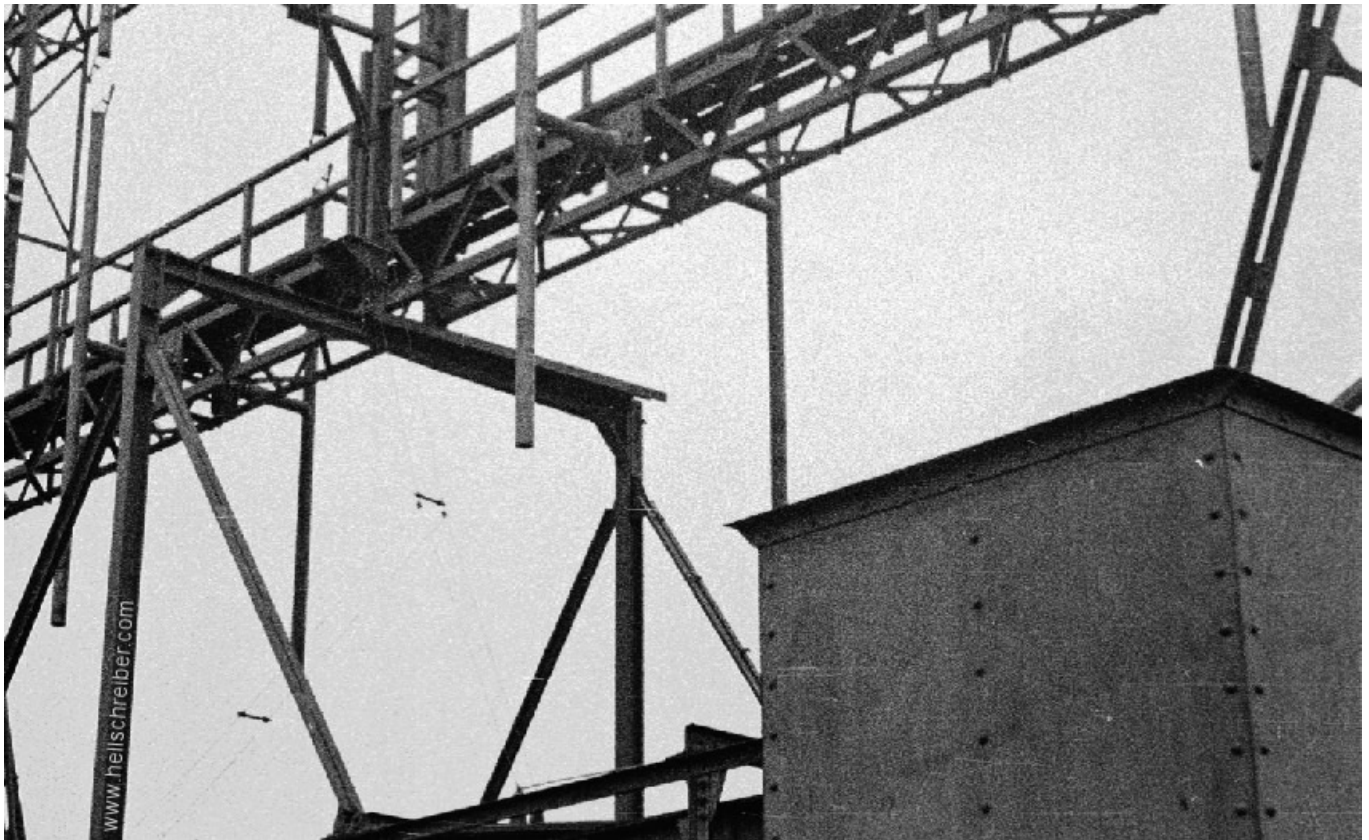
Corner-block of Be-9 at Bredsted/Germany - note the construction details
